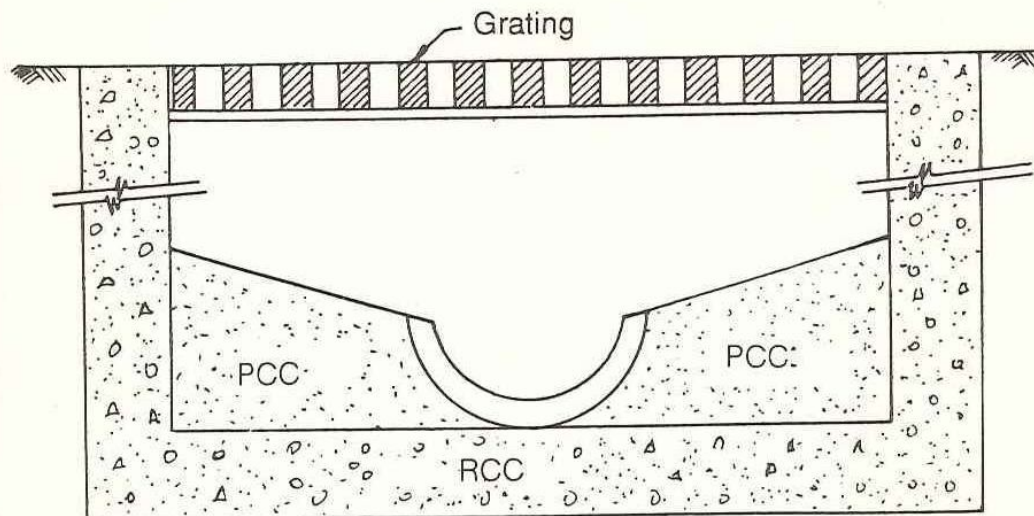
Typical runway drainage system—(d) Detailed cross-section of an inlet structure
